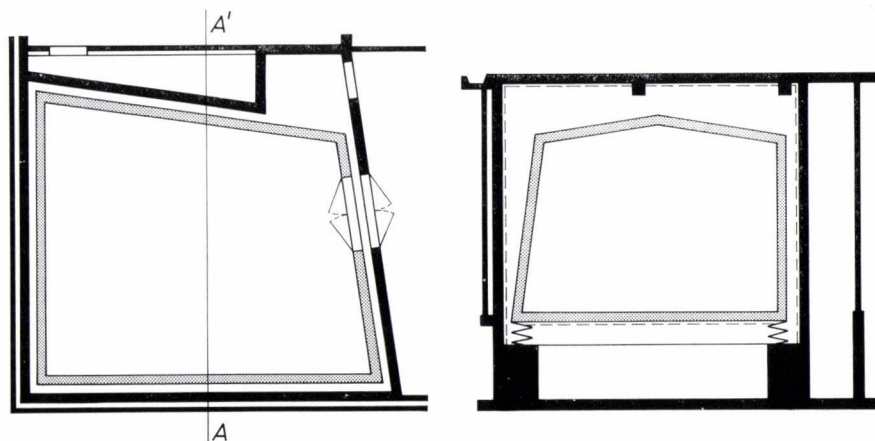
Plan of the reverberation chamber (*left*) and a vertical cross-section along the line AA' (*right*). The concrete wall of the reverberation chamber is shown grey; the sound-insulating brick walls of the enclosure are shown black. To prevent external vibrations from entering the chamber through the floor, the 150-tonne concrete chamber is mounted on 80 steel coil springs.
